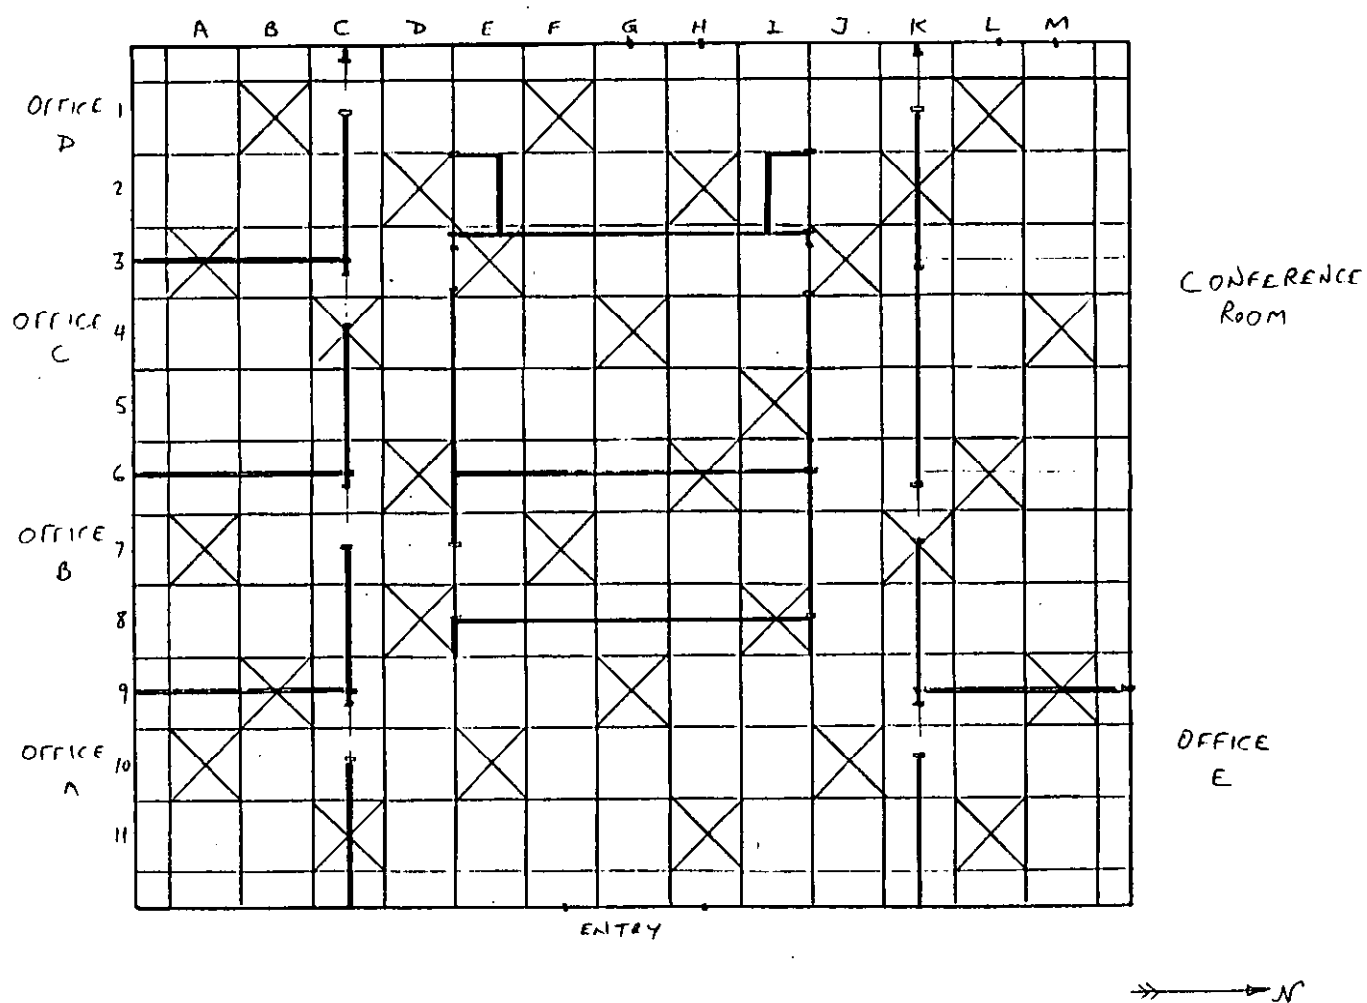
Survey Grid Locations, Building 8 Office Area -- Ceiling
